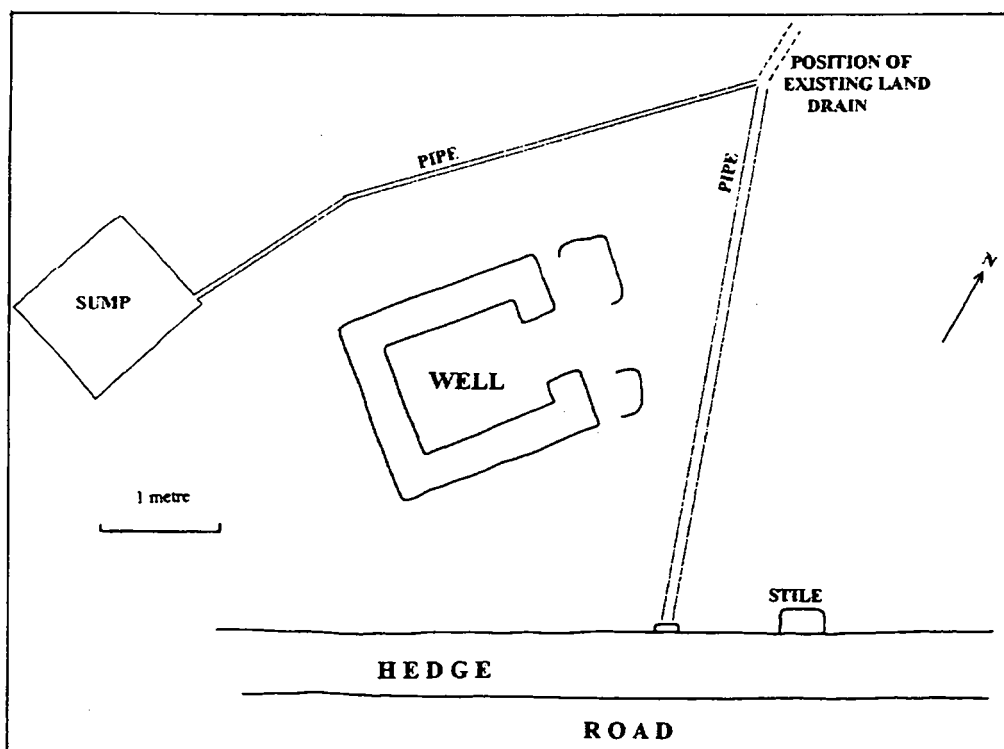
Sketch plan showing the position of sump, trenches and new pipework.
